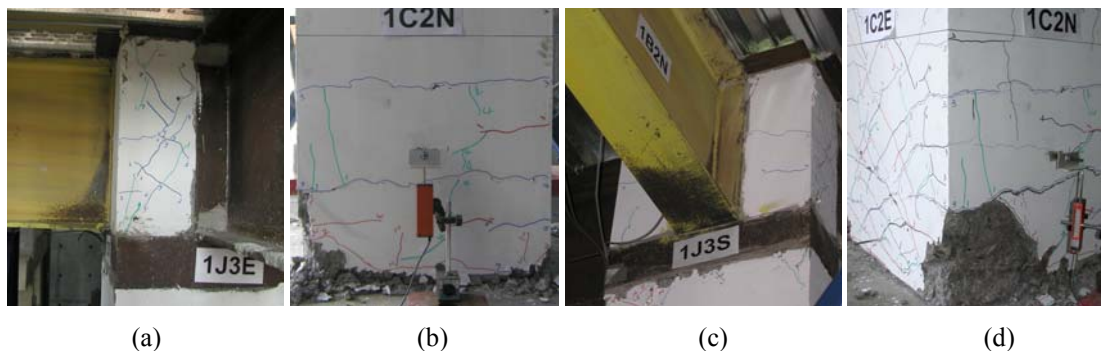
Typical conditions of beams, composite beam-column connections, and base columns following (a, b) design level and (c, d) maximum considered earthquakes.
